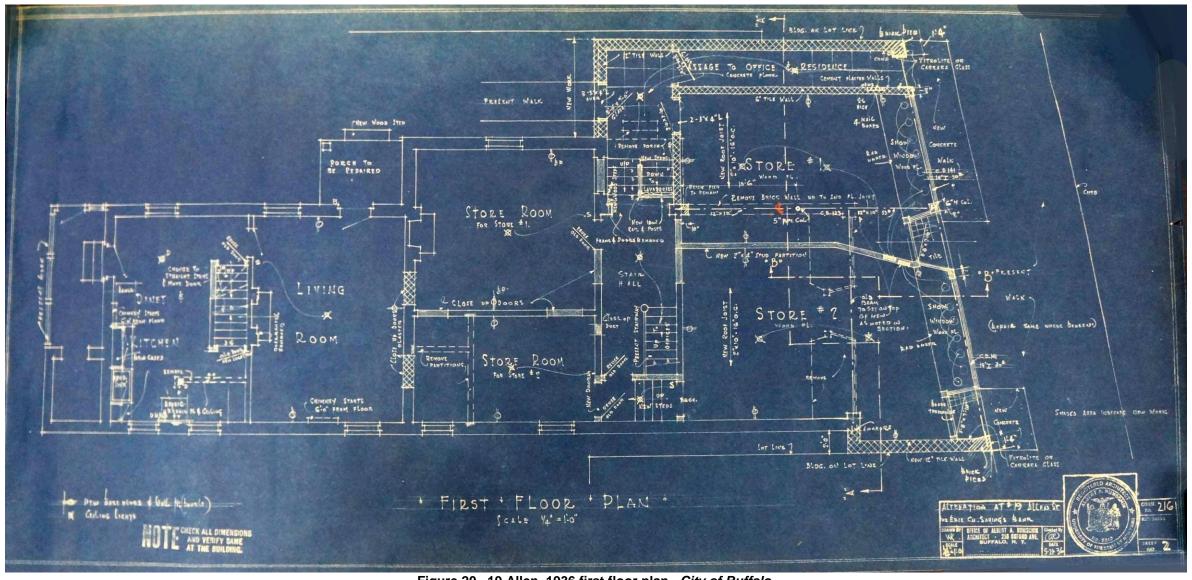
19 Allen, 1936 first floor plan. City of Buffalo.
